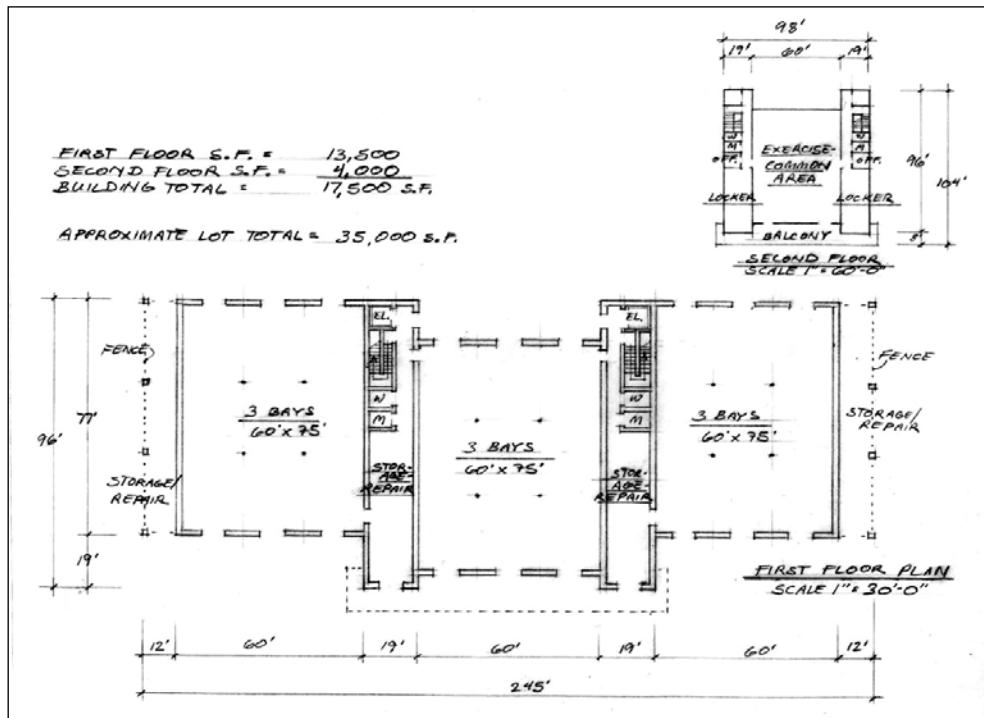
Potential Site Plan for a Boathouse at Dempsey's
